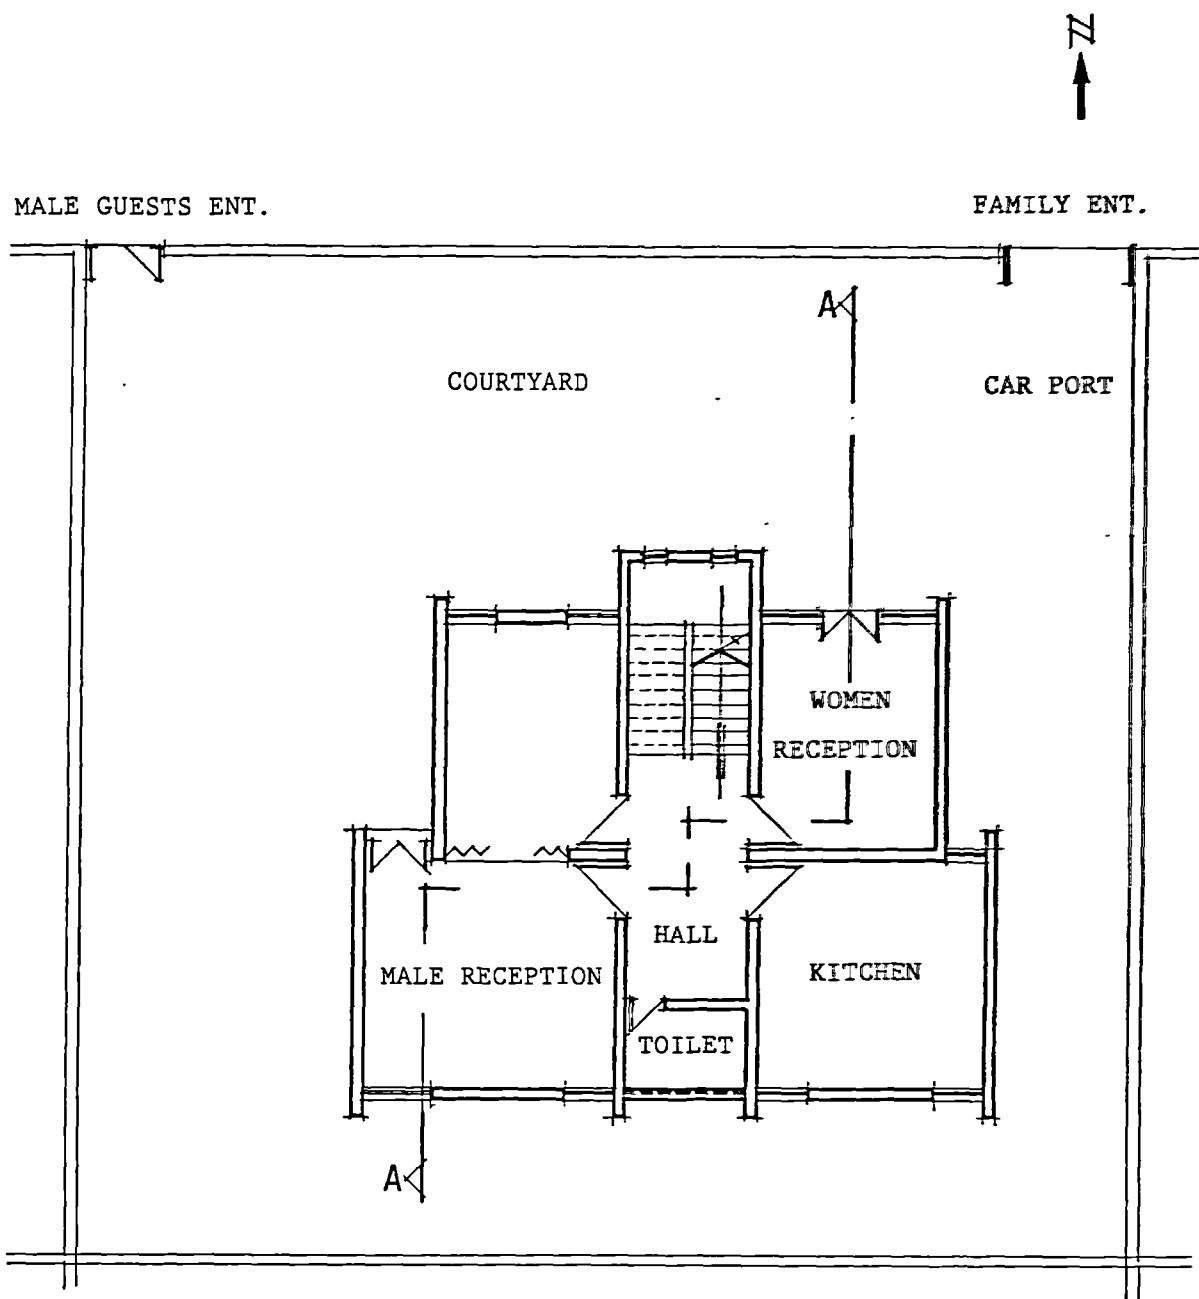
GROUND FLOOR PLAN (before modulation).
